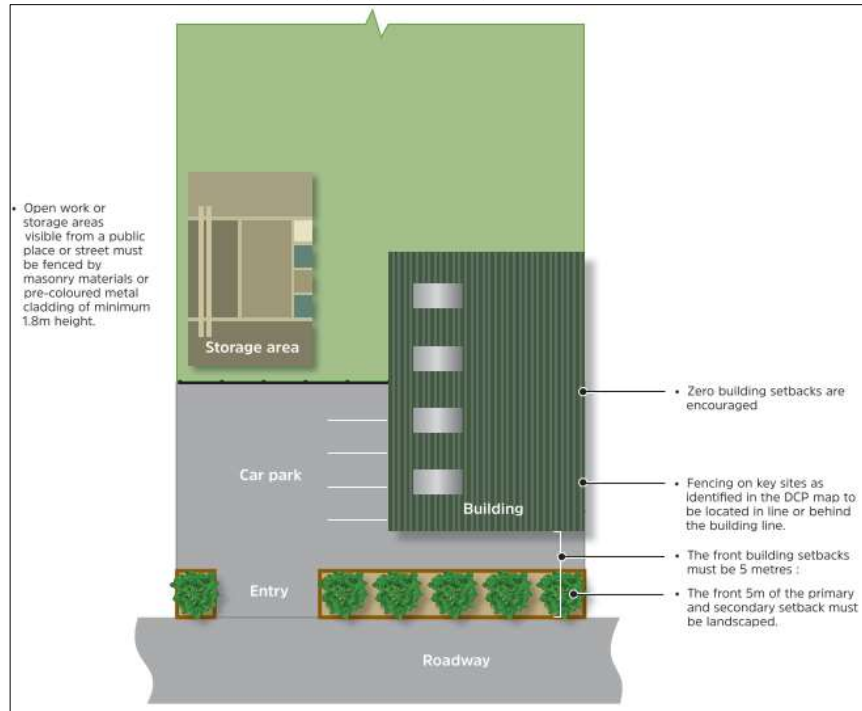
Typical Site Layout - Ring Road (Bandaar Drive) and Goddard Lane Sites only
